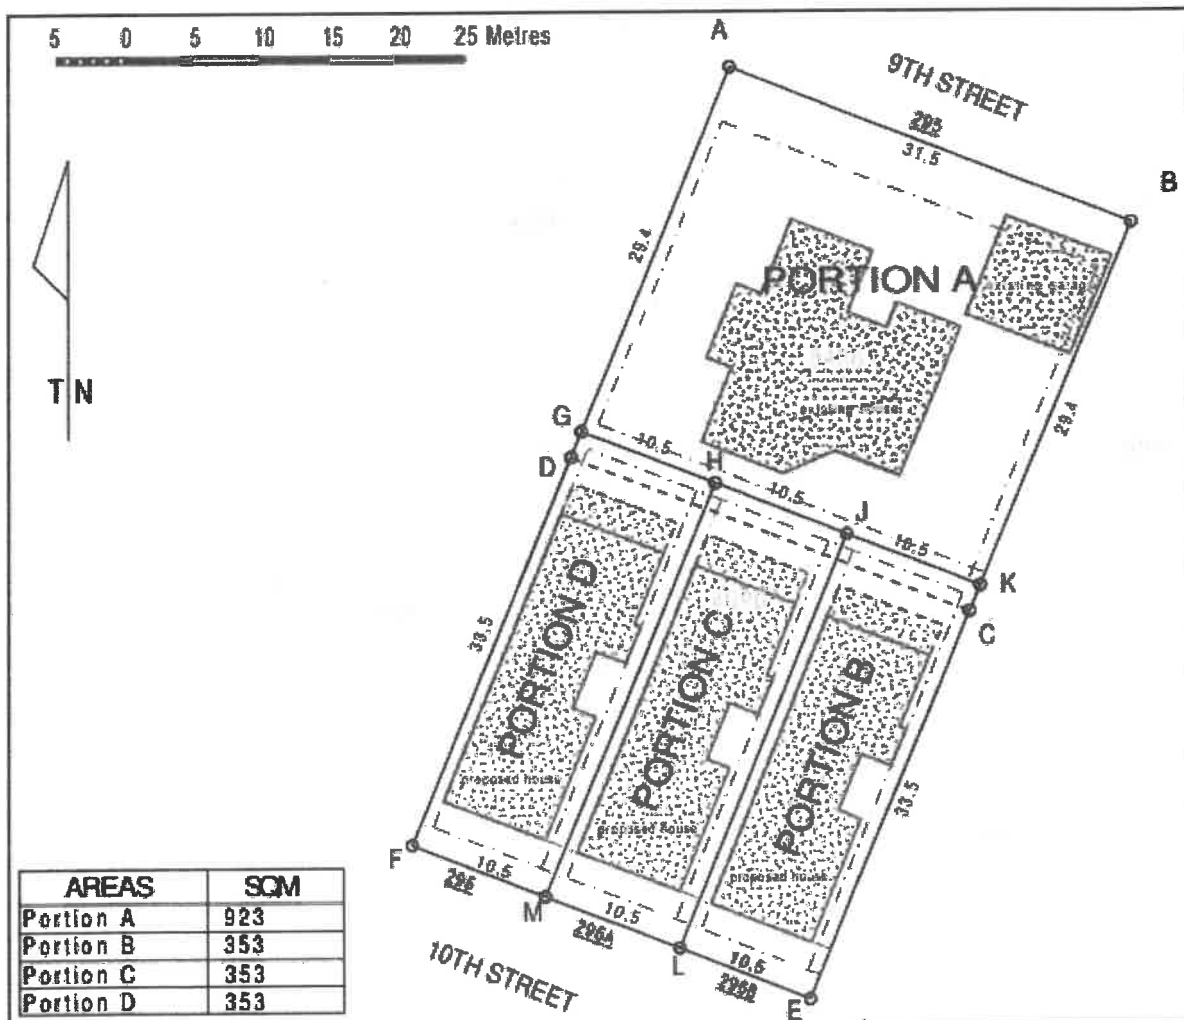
The plan of the proposed consolidation of the two erven and the subdivision into four portions.
